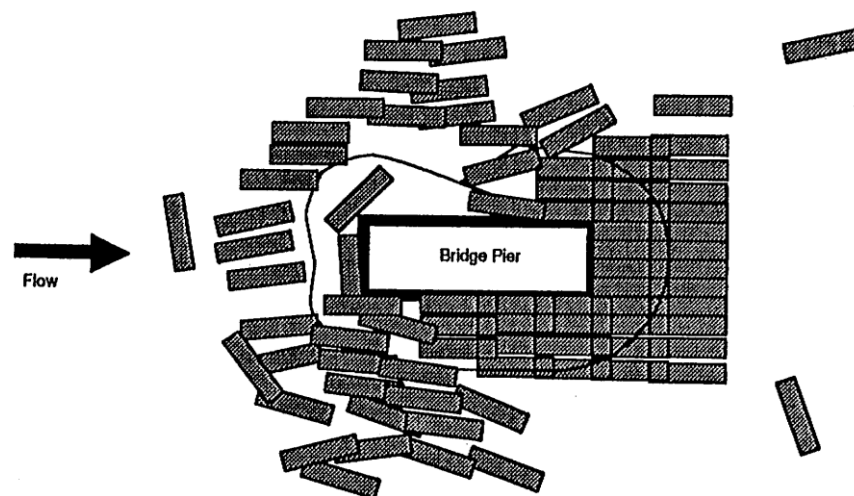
Grout-filled bags failure method (Parker et al., 1998).
